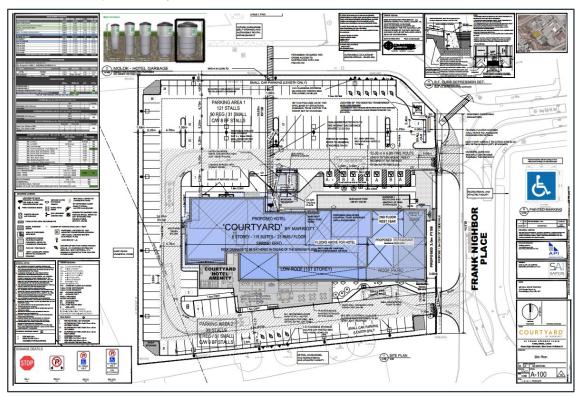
Proposed Site Plan prepared by Saplys Architects Inc., provided by the Client.
